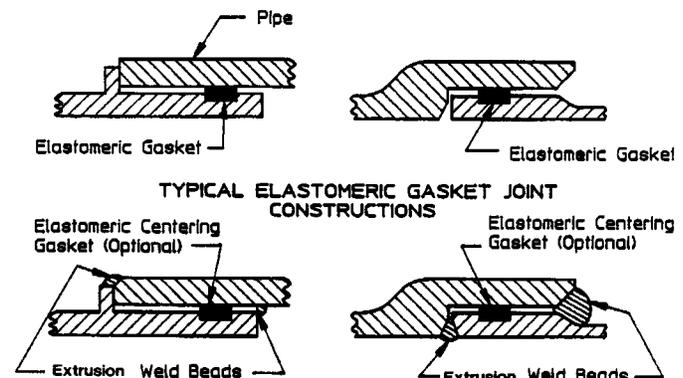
Typical Extrusion Weld Joint Constructions
